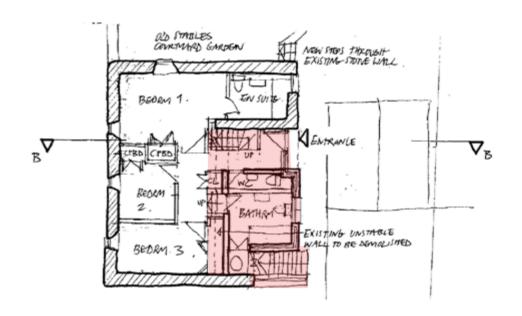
The Old Stables Manor Farm Proposed Ground Floor Plan
